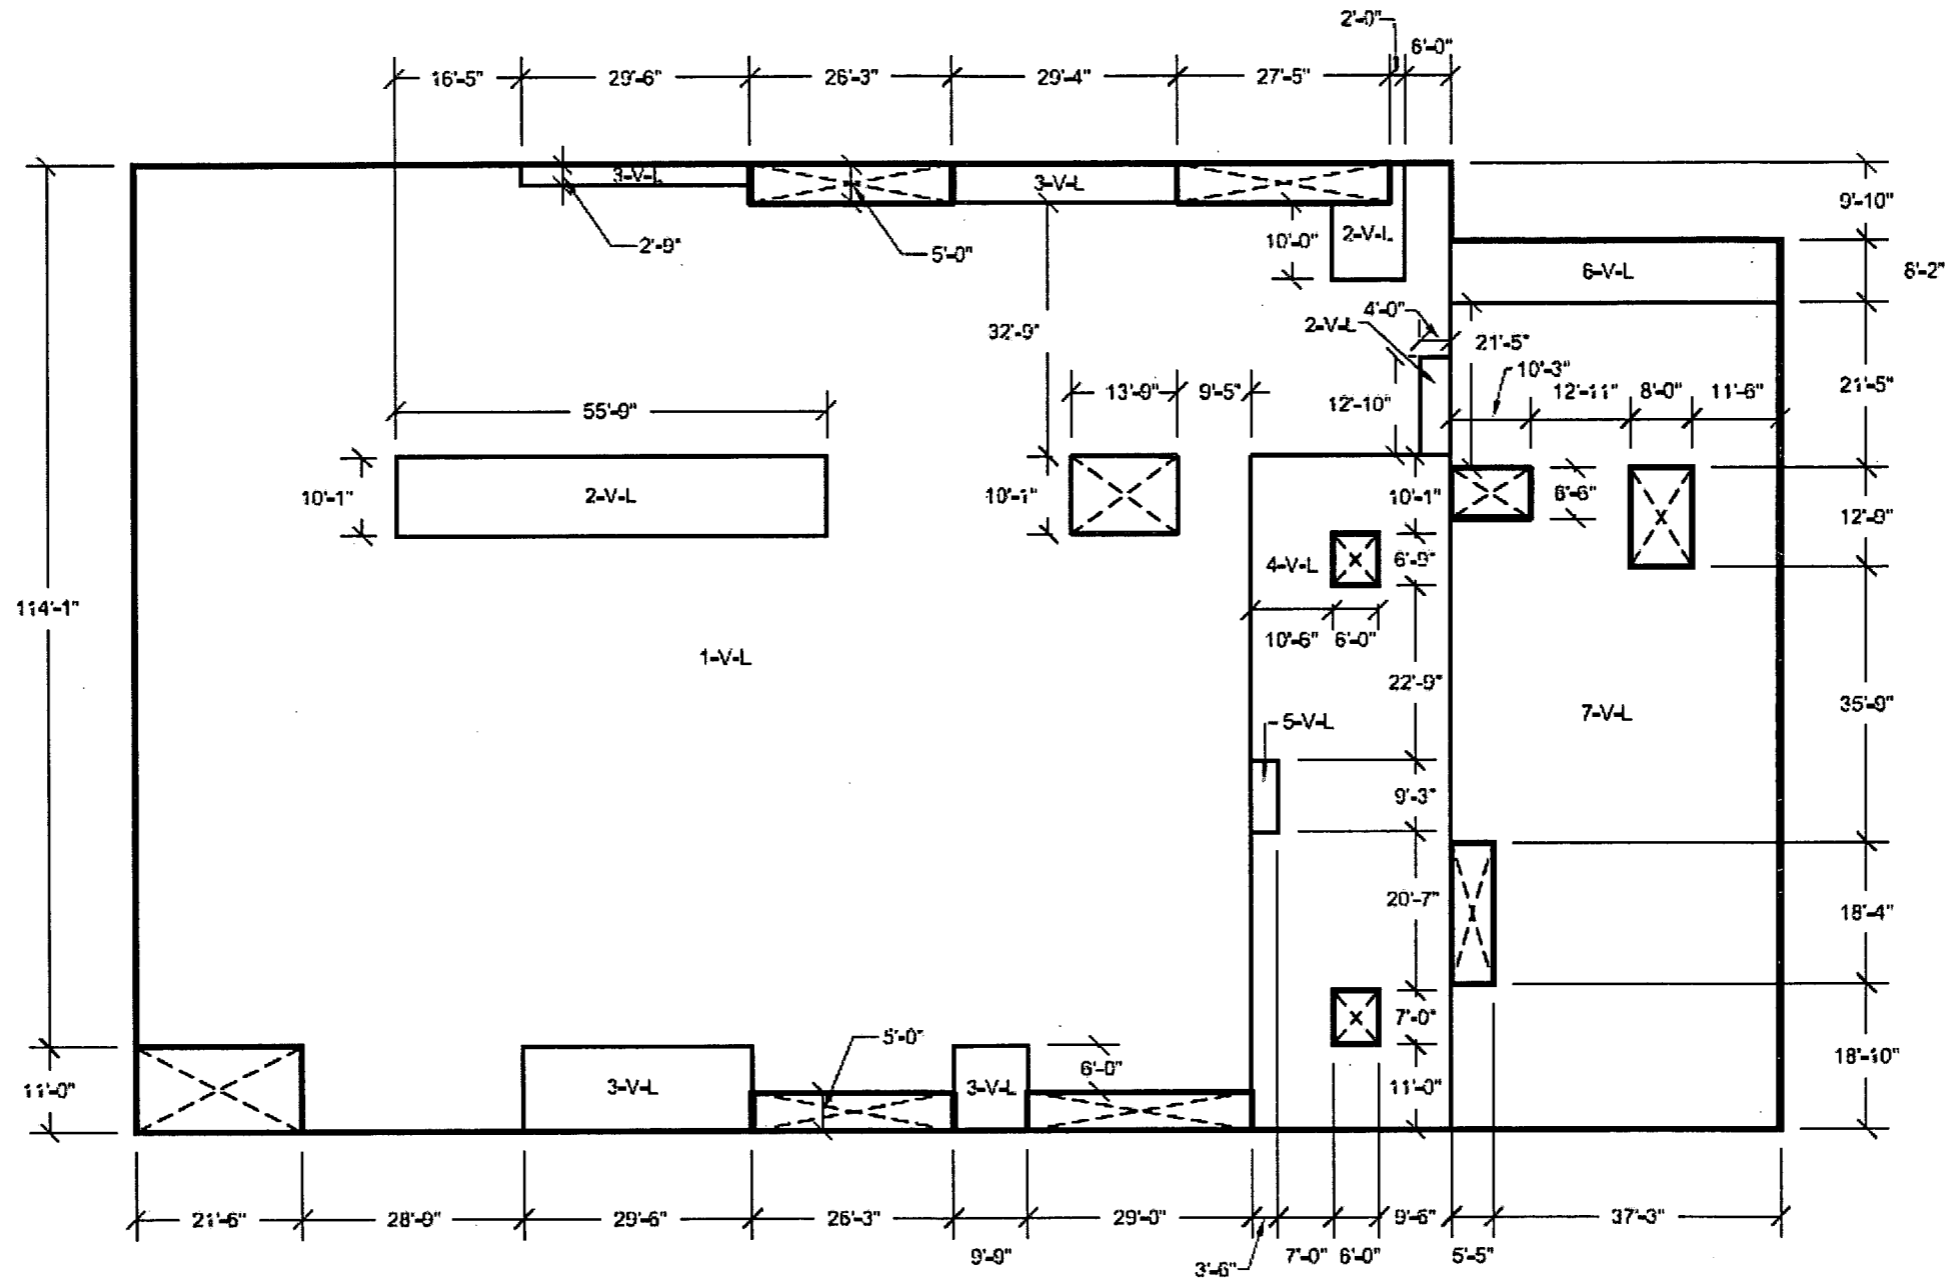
H.3-33: ELEVATION 35 LOOKING DOWN
